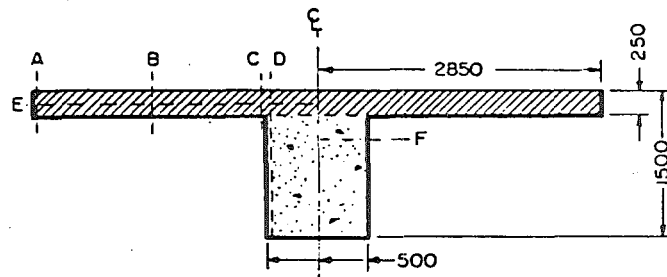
COOLING OF BRIDGE SECTIONS HEATED FROM CEMENT HYDRATION
